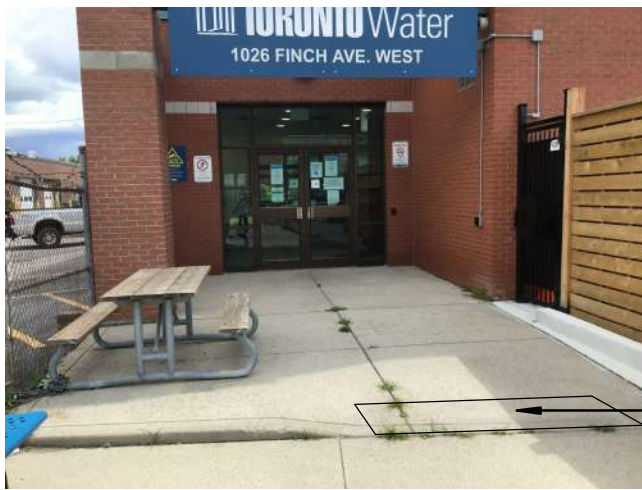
MAIN ENTRANCE, EXISTING CURB RAMP
